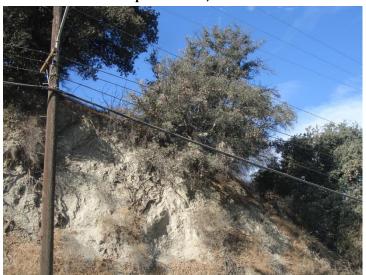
Frontage Retaining Wall on San Fernando Road: September 27, 2016
